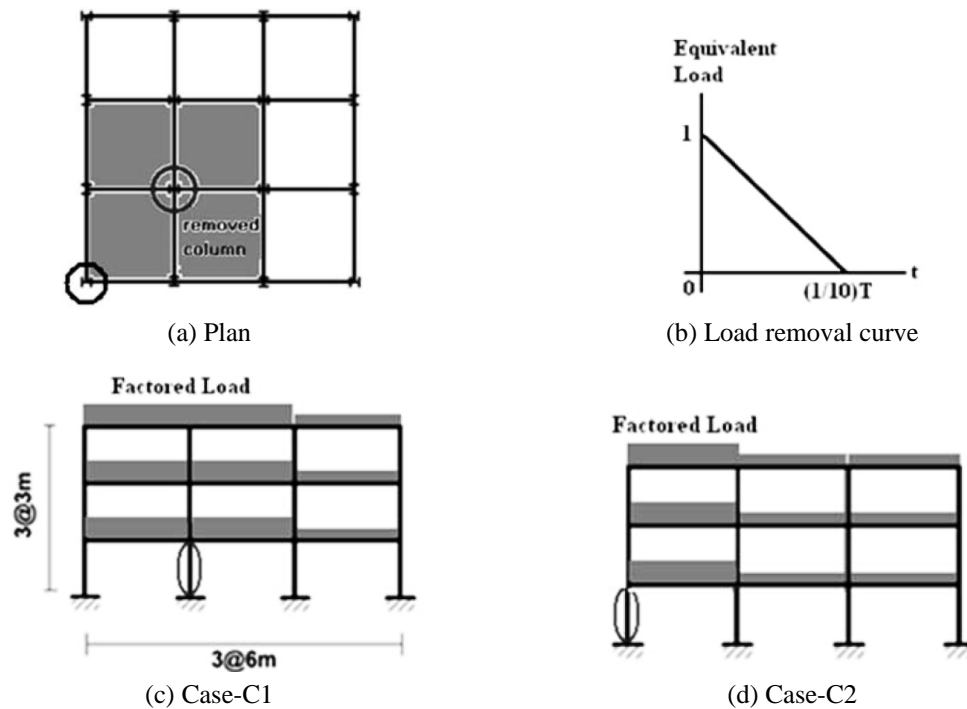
(a) structure plan; (b) load removal curve; (c) and (d) missed columns scenarios
